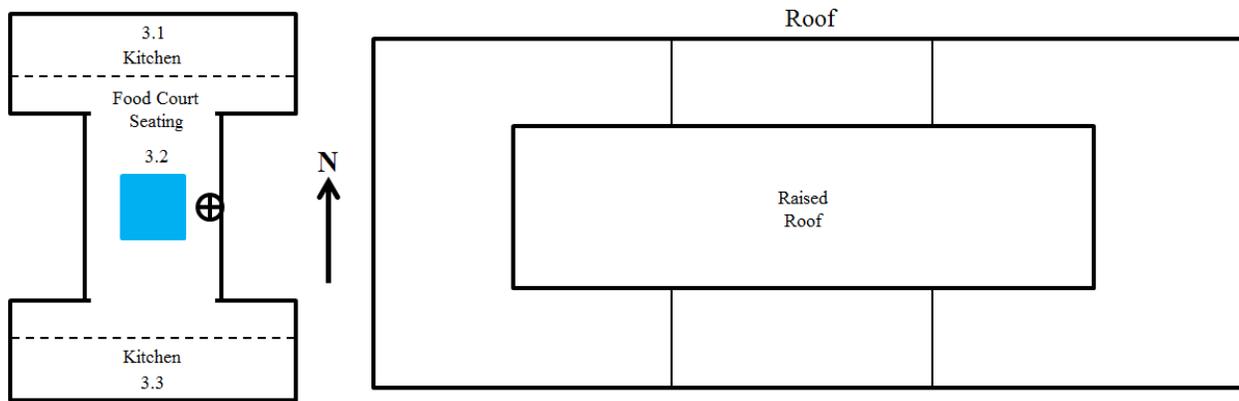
Earthquake damaged WPI Mall food court and roof layout
